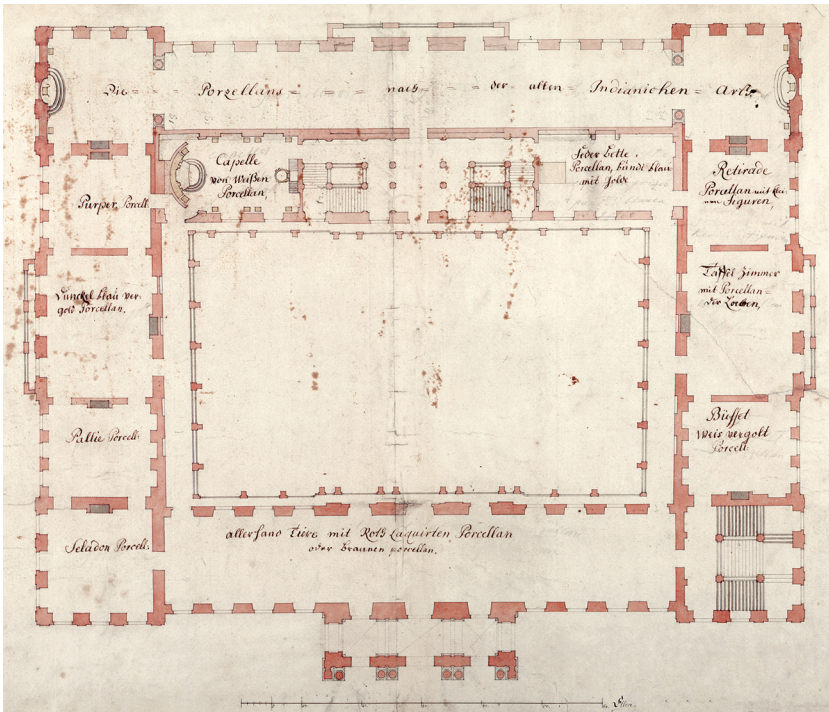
Japanese Palace, floor plan of the upper floor, 1730.
